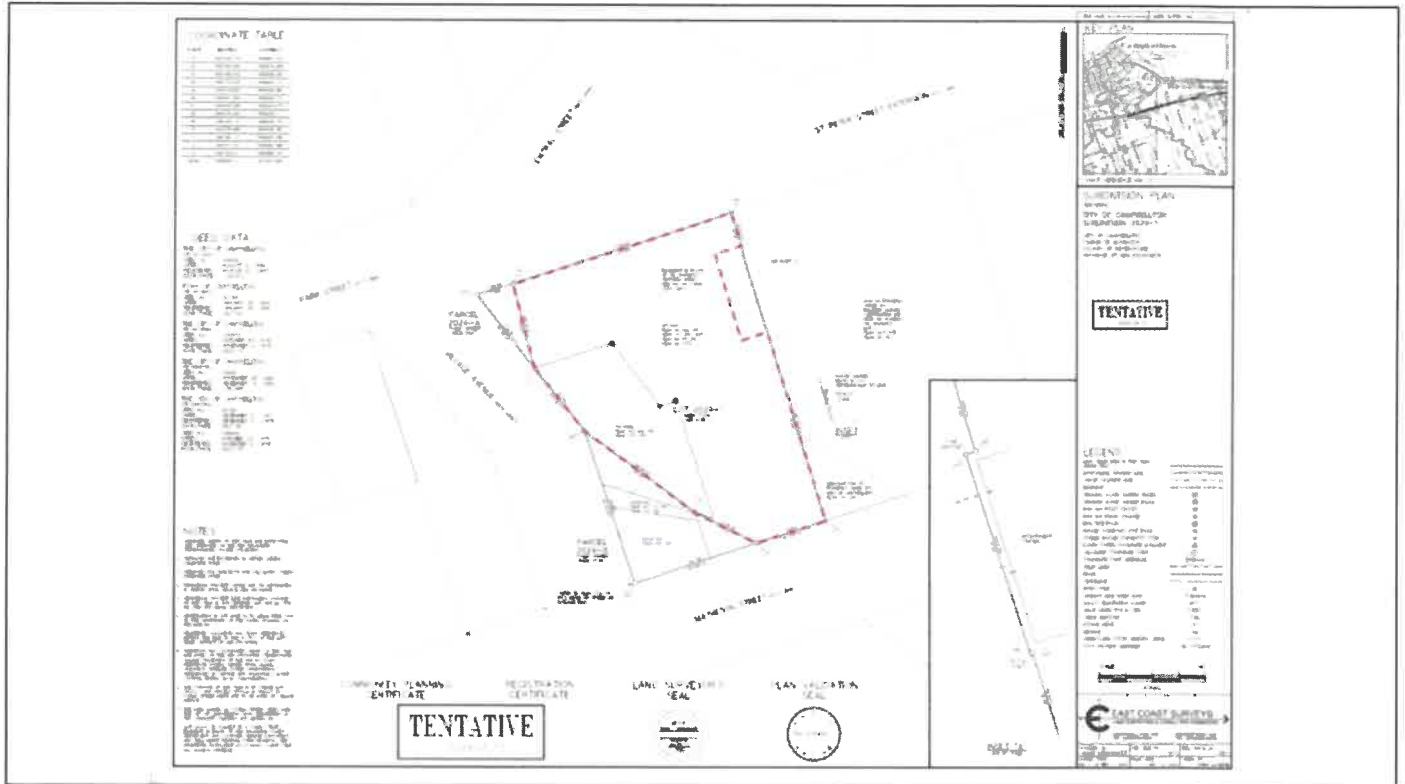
Revised tentative subdivision plan / Plan provisoire de lotissement révisé
